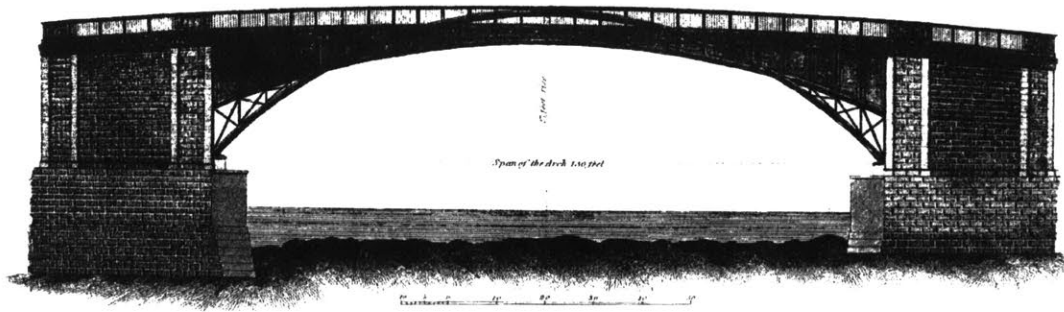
Buildwas Bridge (1795) (Telford, Bridge 1812)
